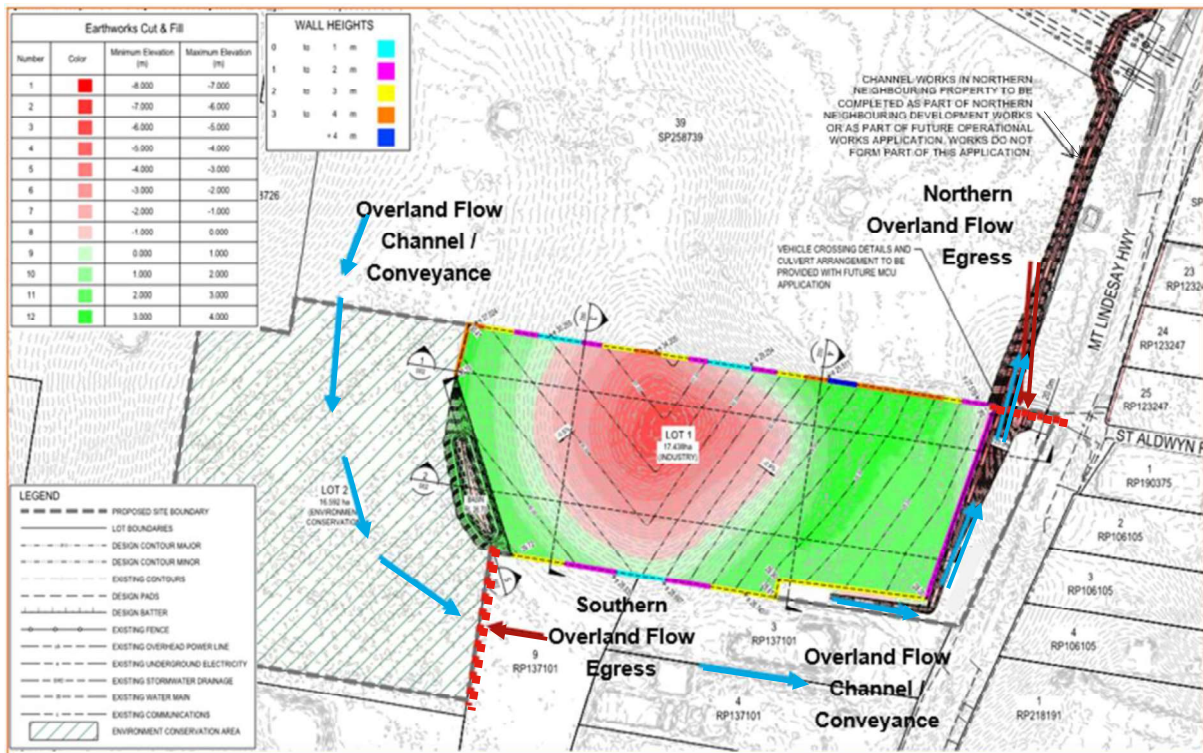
Concept Proposed Bulk Earthworks Layout
